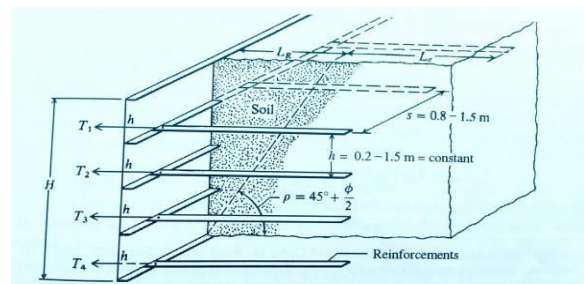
; Typical range in reinforcement spacing for reinforced earth walls.
